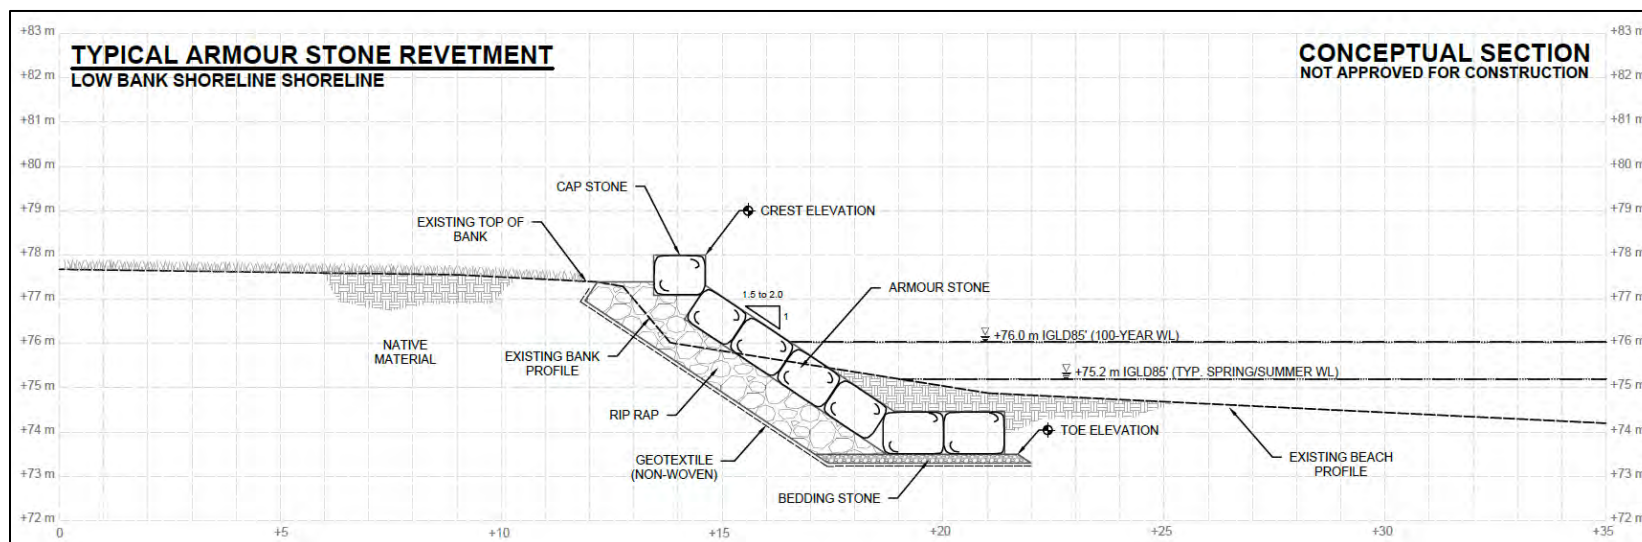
Recommended Typical Armour Stone Revetment Concept for a Low Bank (<3 m)
